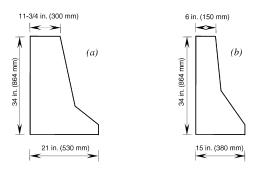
Cross sections of barrier walls: (a) PL3 wall; and (b) PL2 wall.
